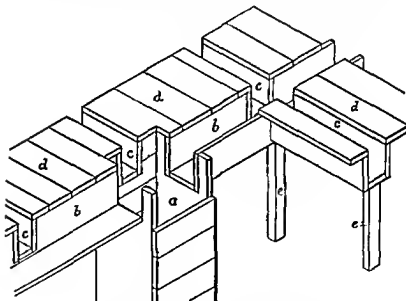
Column, Beam, and Floor Slab Moulds.
